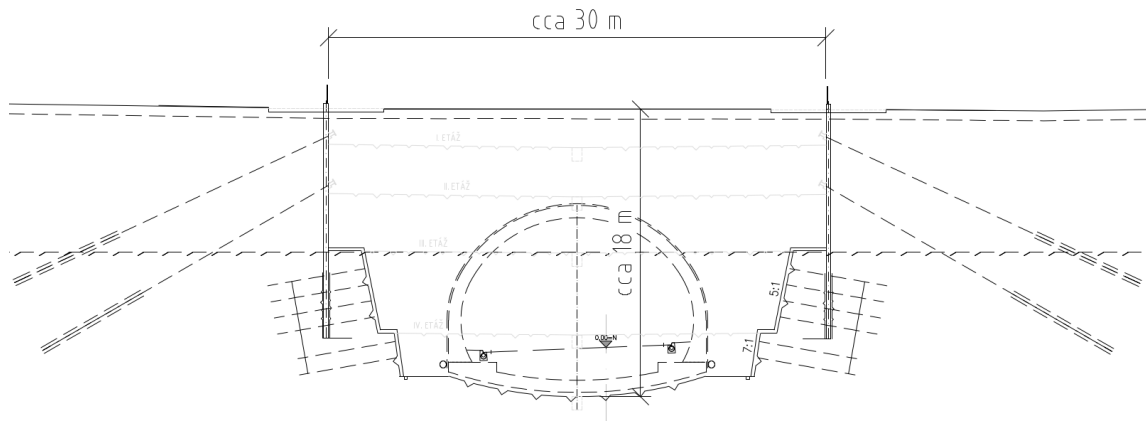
Cross-section through the excavation (Amberg Engineering Slovakia, s.r.o. 2015)
